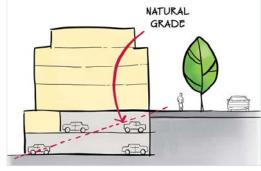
Use natural slope for under-building parking wherever possible (3.1.1. c).
